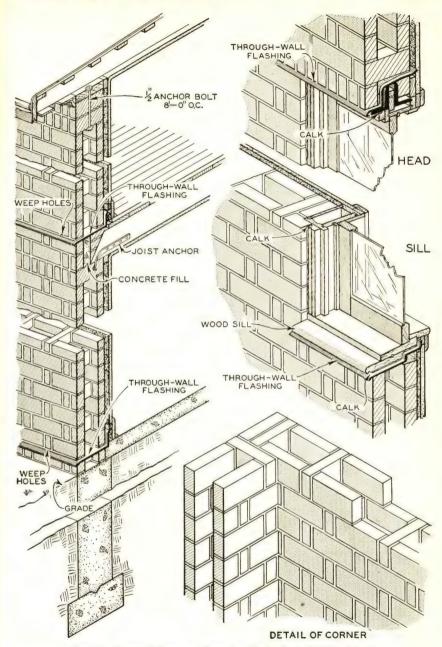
Pictorial View and Details of Eight-Inch All-Rolok Wall
